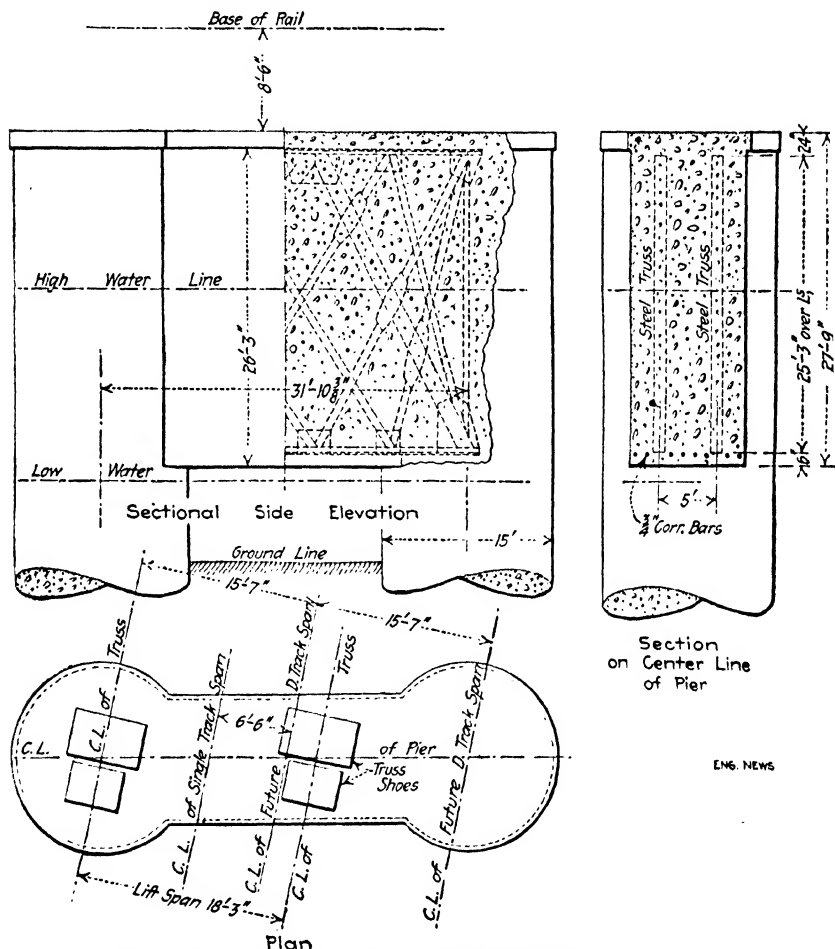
Cylinder Piers Braced by a Truss Encased in Reinforced Concrete.
